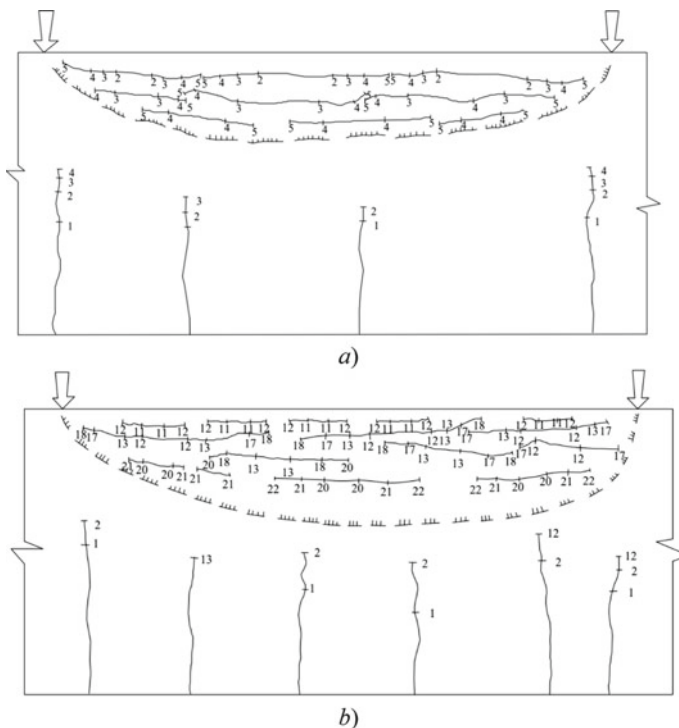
Picture of the formation and development of normal cracks in the stretched area and horizontal cracks in the concrete of the compressed zone: a with stationary cyclic loading; b with a regime non-stationary cyclic load
